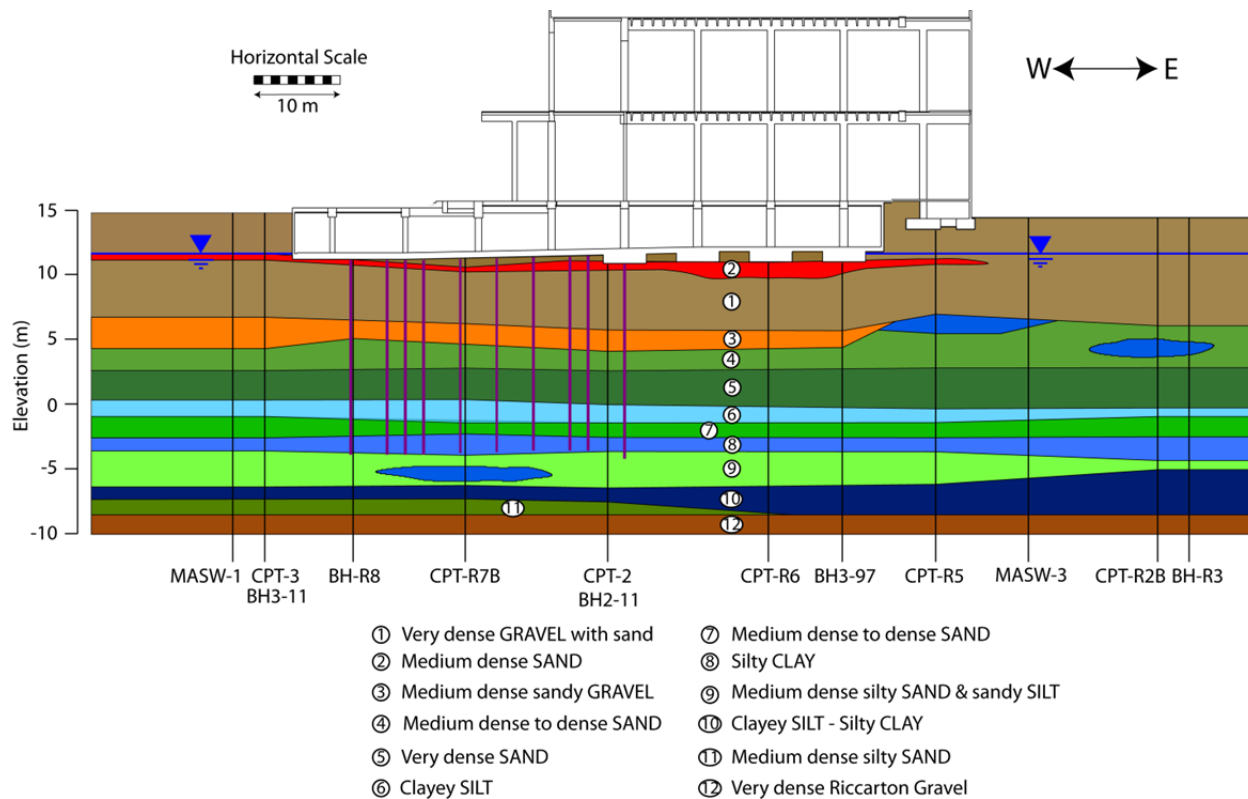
Subsurface conditions at Building C showing different geotechnical units and structural frame at cross section C-C'.
